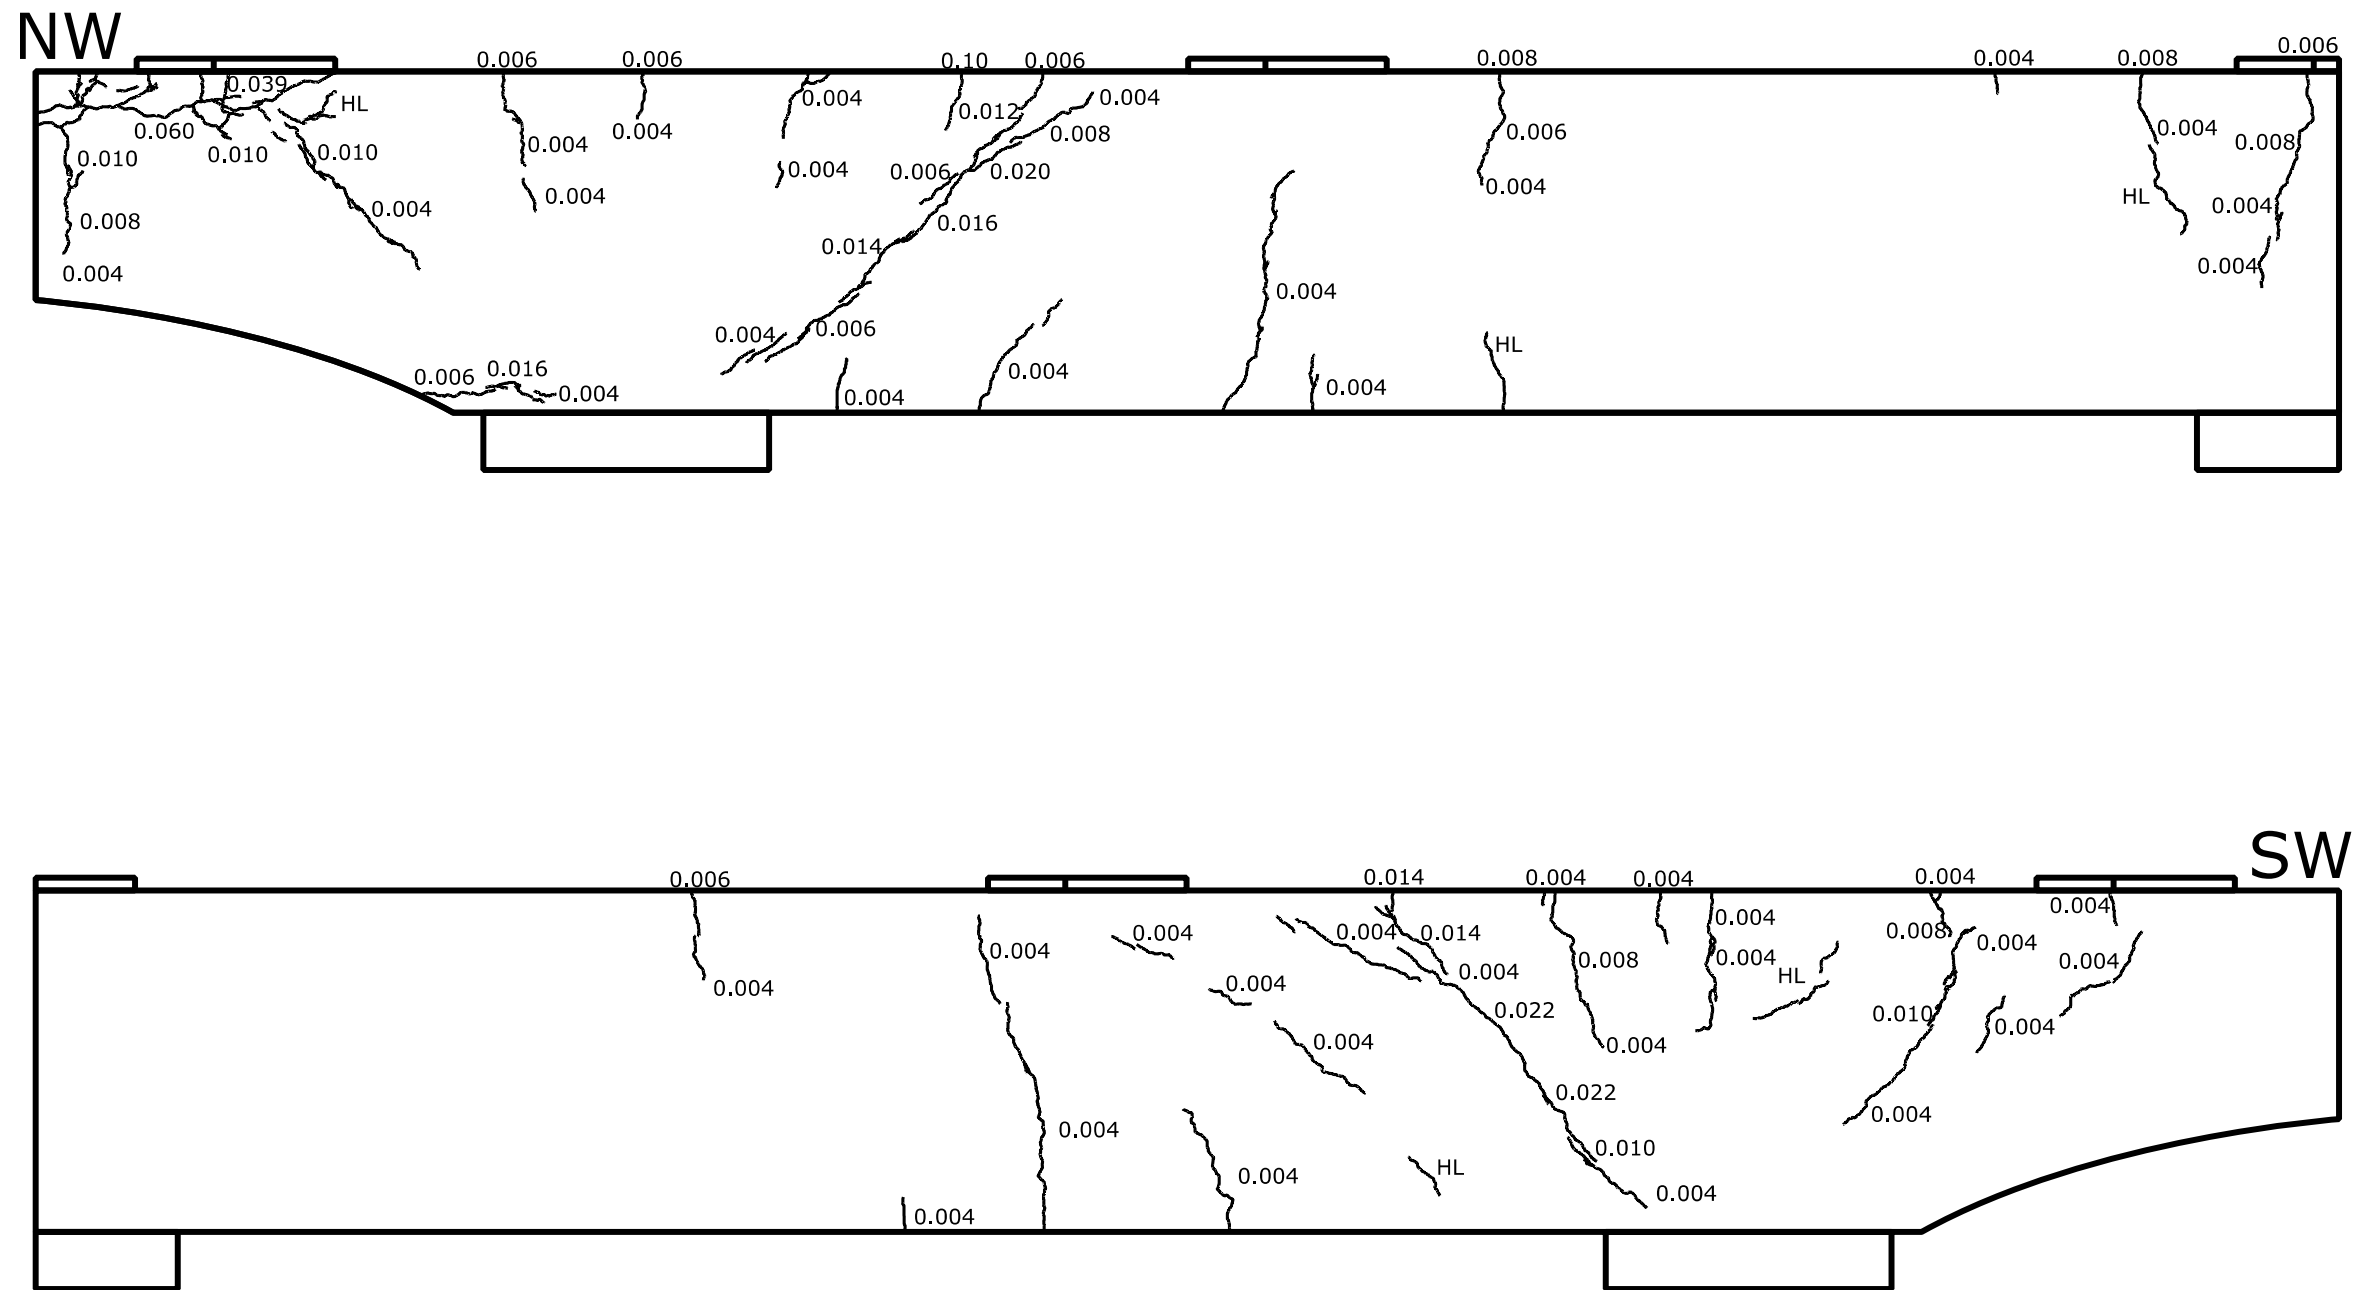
West face of BC2: cracking measured from laboratory inspection; crack widths reported using units of inches
